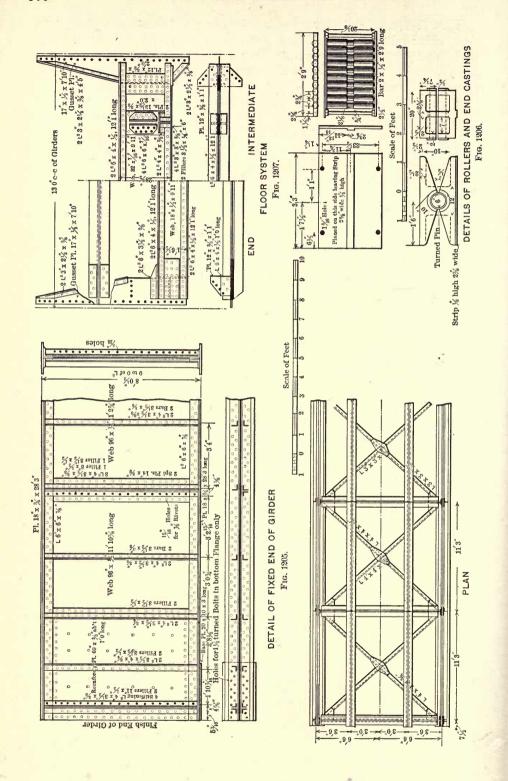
, 1206, and 1207 are plans, elevations, and details of a plate-girder river bridge built for the New York, New Haven and Hartford Railroad by the Berlin Iron Bridge Company within the limits of the builders' yards. It is a single-track bridge 102' 9" from end to end of girders fixed at one end and supported on rollers at the other.
